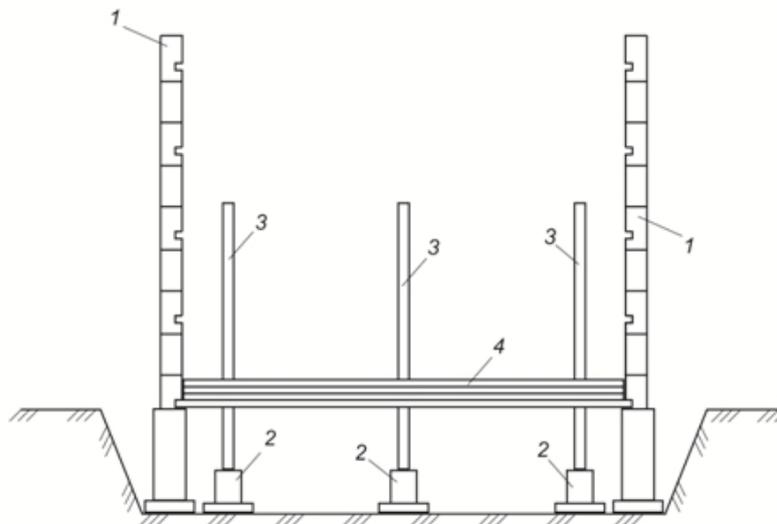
Layout of the embedded carcass. Floor lift technique at the stage of concrete placing for the panels floor:
